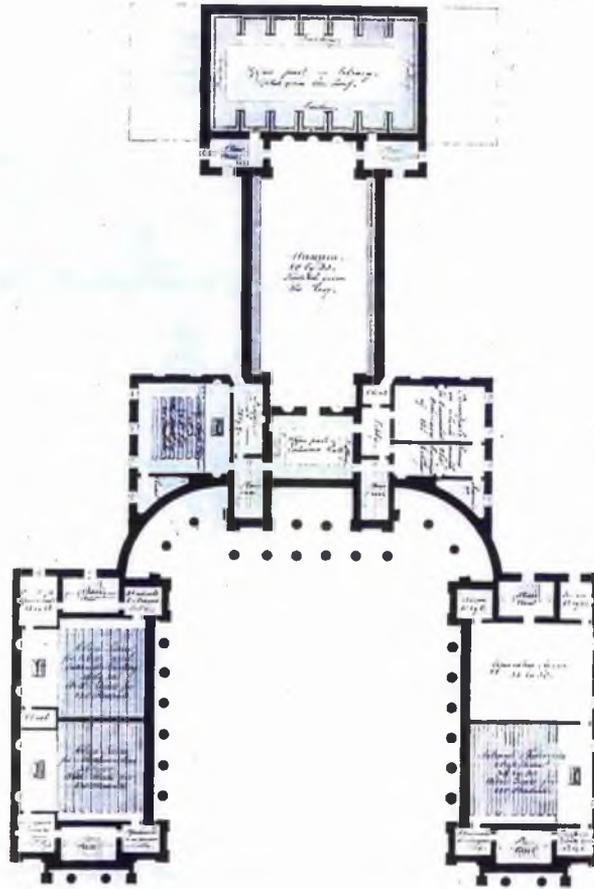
Marischal College. Principal floor plan. R. Reid, 1834.
